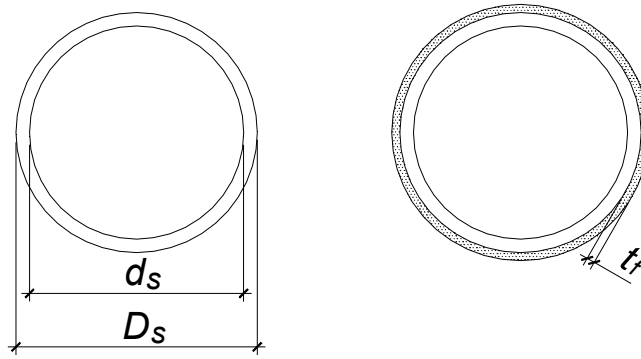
Cross-section of non-strengthened (left) and strengthened (right) member
